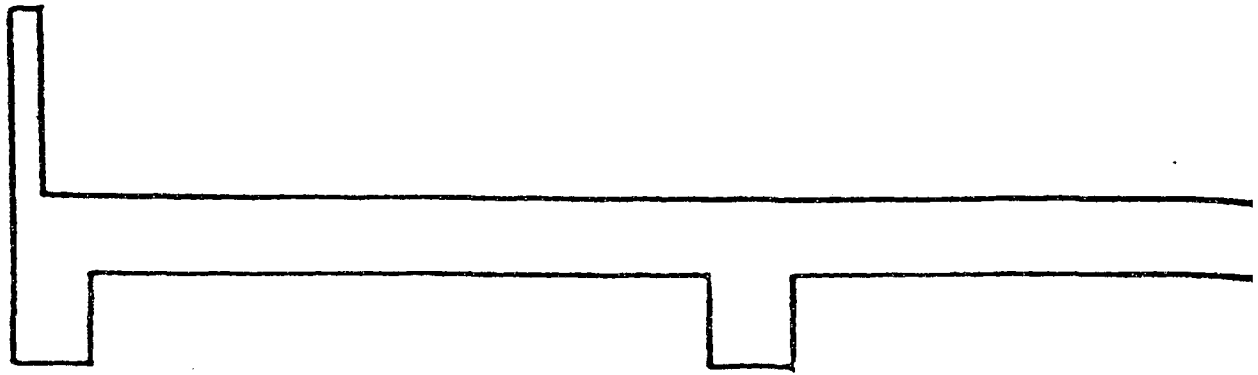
Schematic Continuous span slab construction as cast [4]
